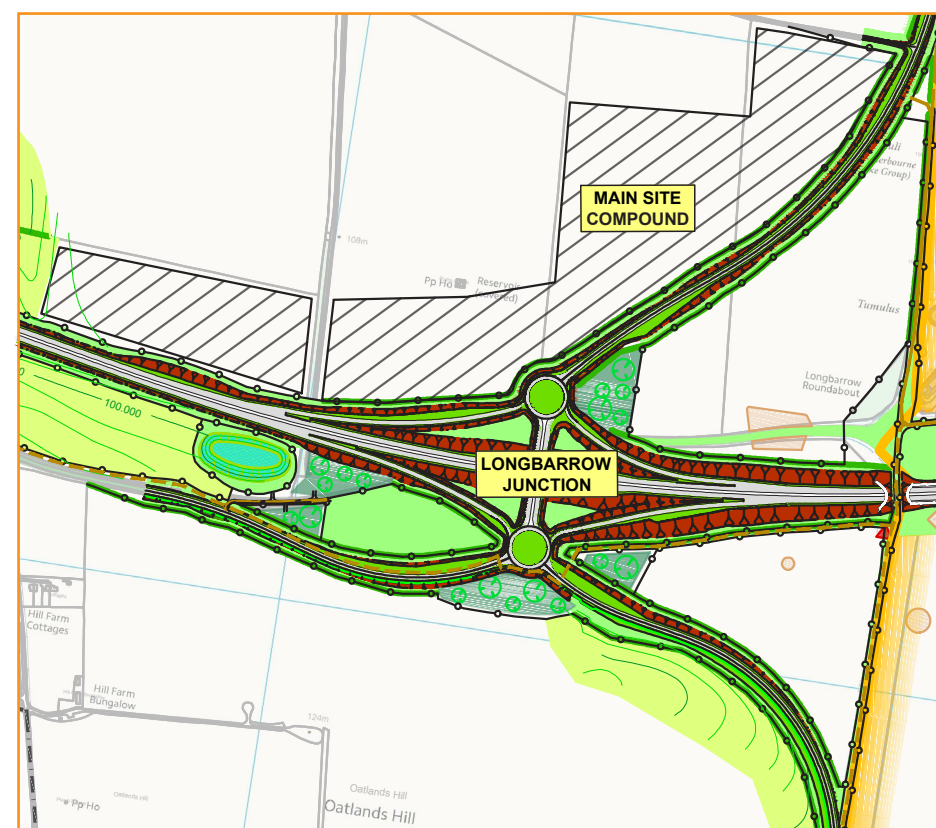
Plan showing location of main site compound, north-west of Longbarrow roundabout
